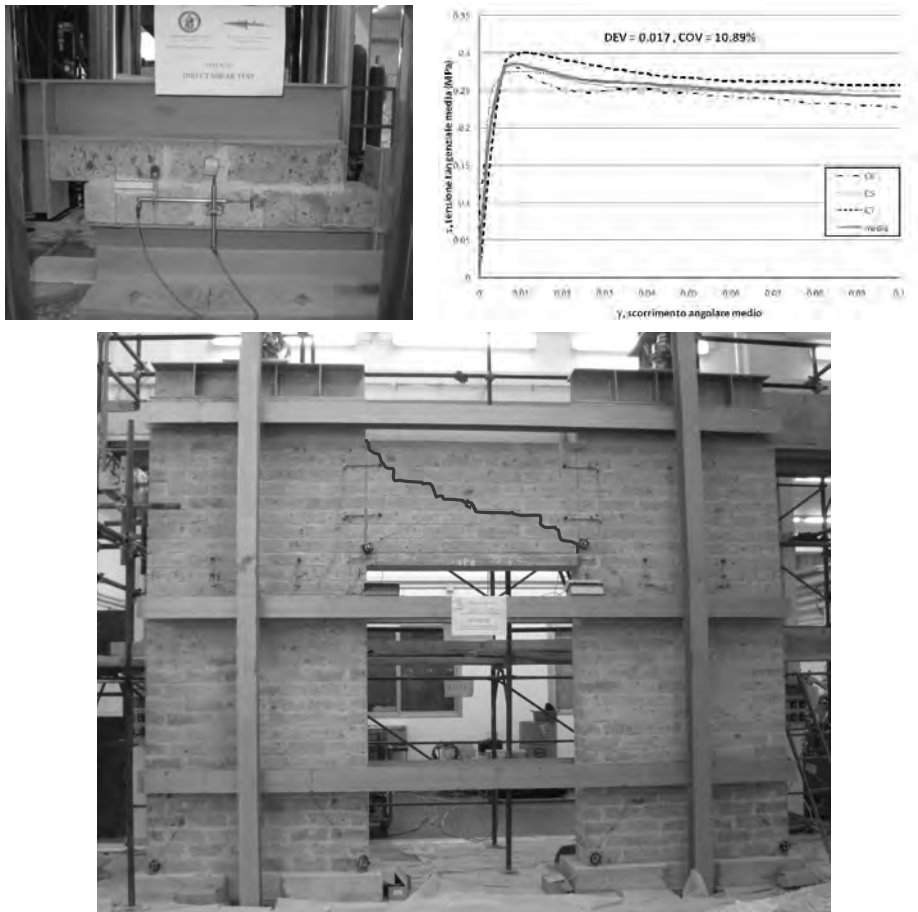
Direct shear test on mortar joints in tuff masonry (Augenti and Parisi, 2009c). Tests on single storey masonry portal for the evaluation of the spandrels.
